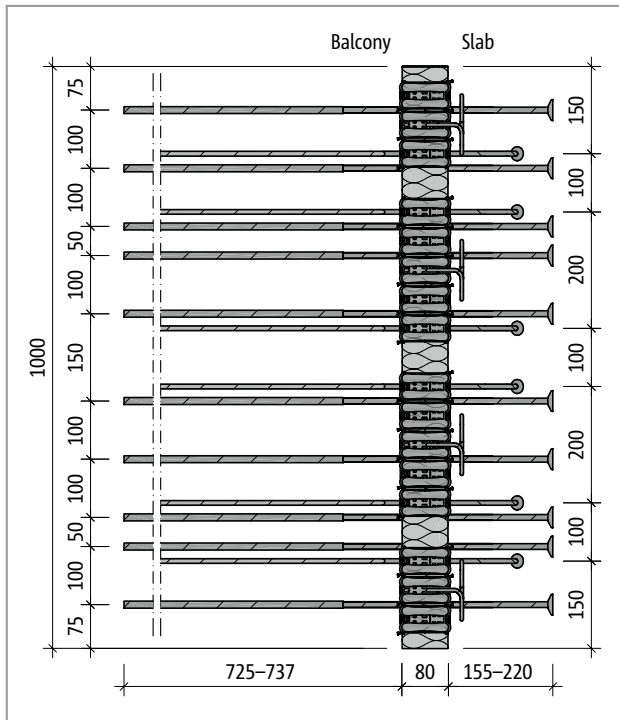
Schöck Isokorb® T type K-U-M4: Product layout
